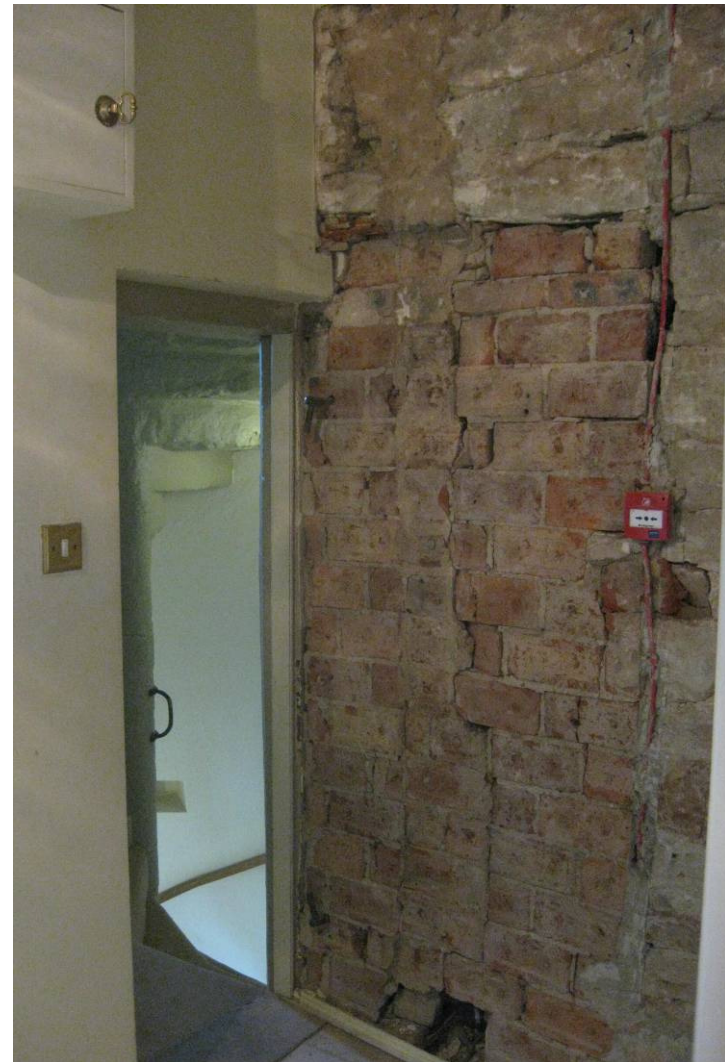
Brick blocking at southern end of Corridor 205, and possibly narrowed doorway to Stair 206
